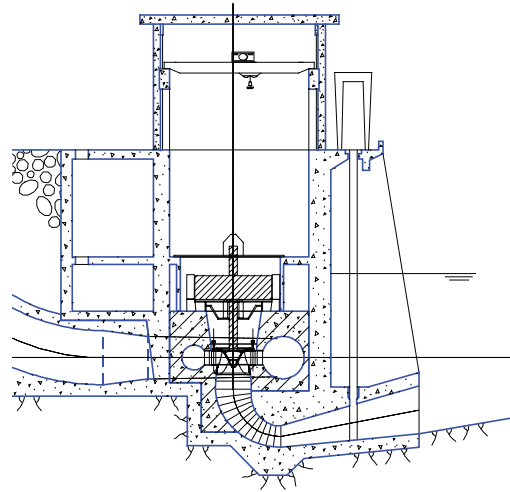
Indoor Powerhouse – typical cross-section.
